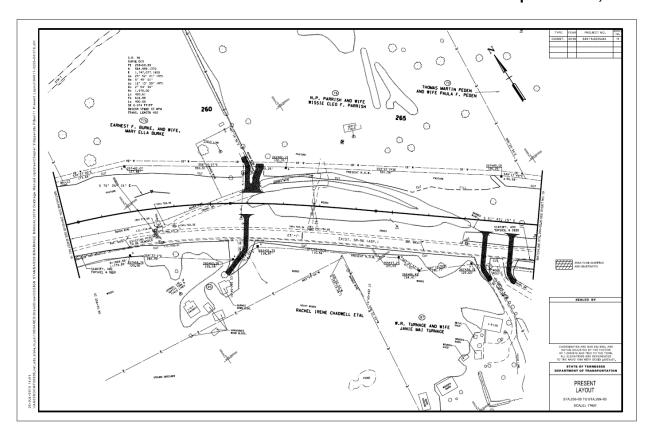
A-6A Example of Present Layout Sheet w/ Pipe Culvert
